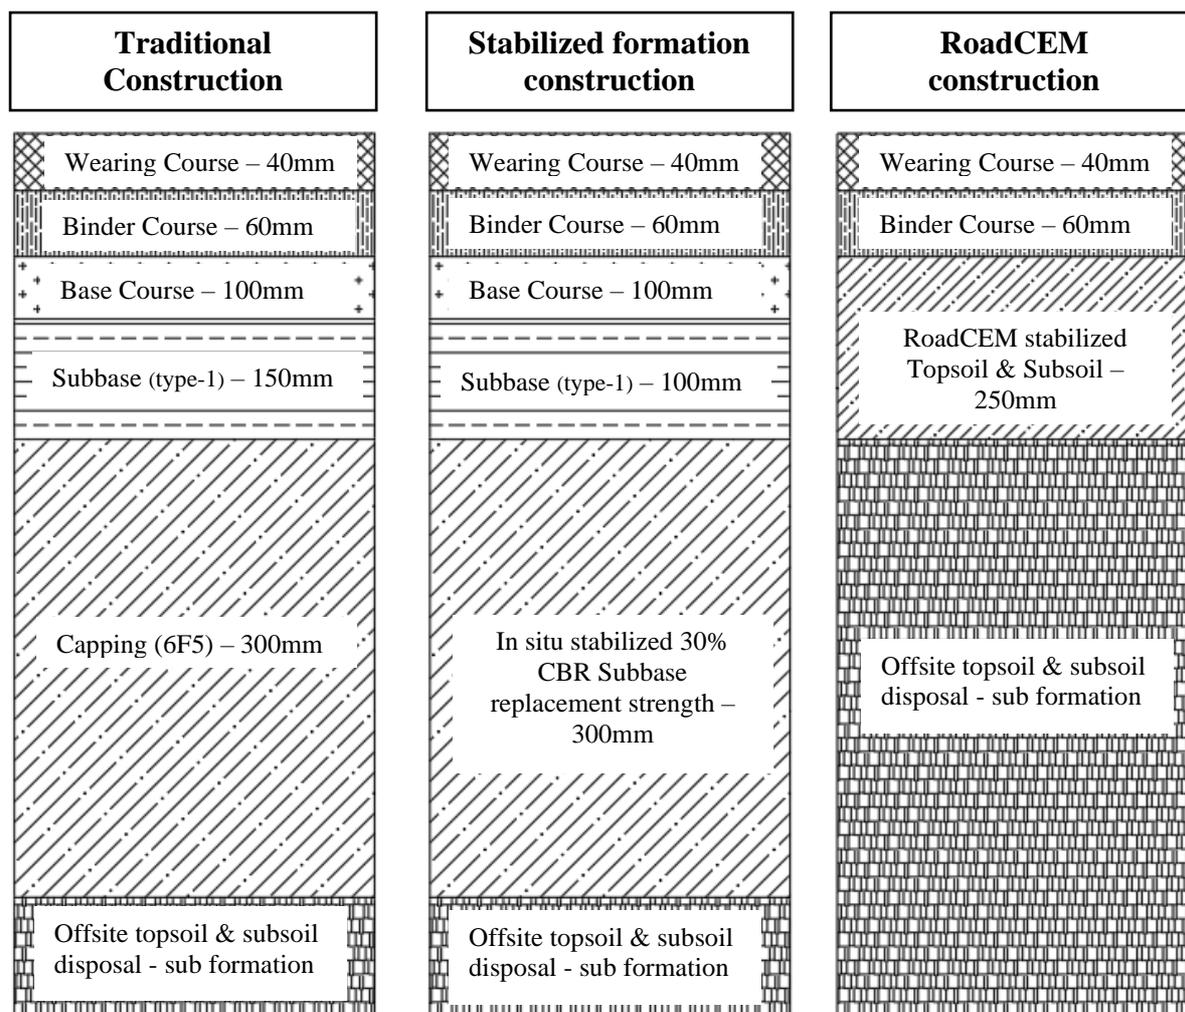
Depth of layers in typical pavement construction (modified after Marjanovic et al. (2009))
